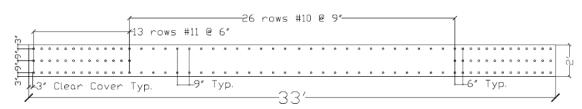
Wall Cross Section at 1st Floor Showing Required Reinforcement for Flexural Strength
